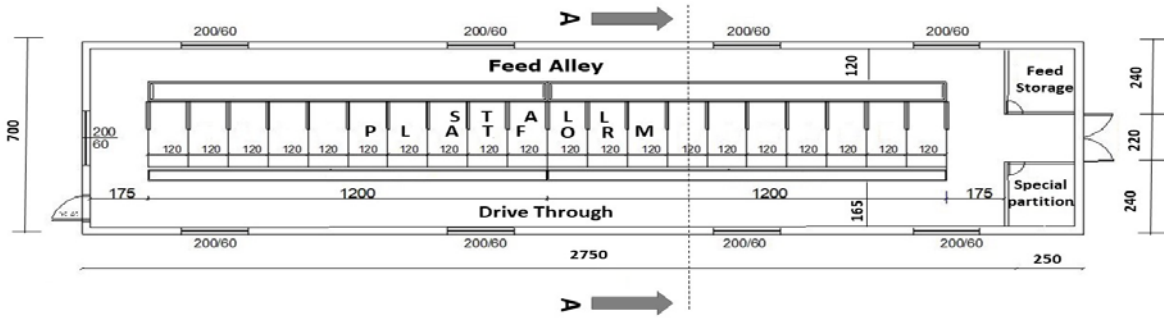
The floor plan of 20-headed prefabricated barn with lightweight concrete
